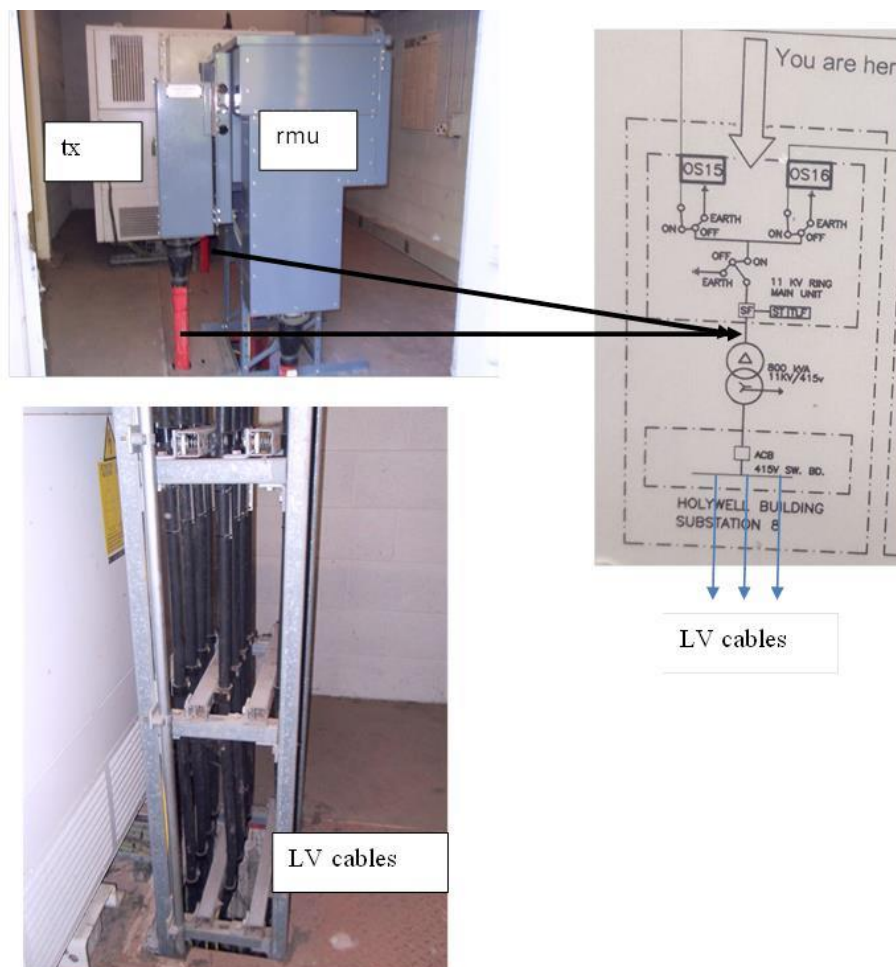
Substation, Holywell Building, Substation 8, schematic and photo
